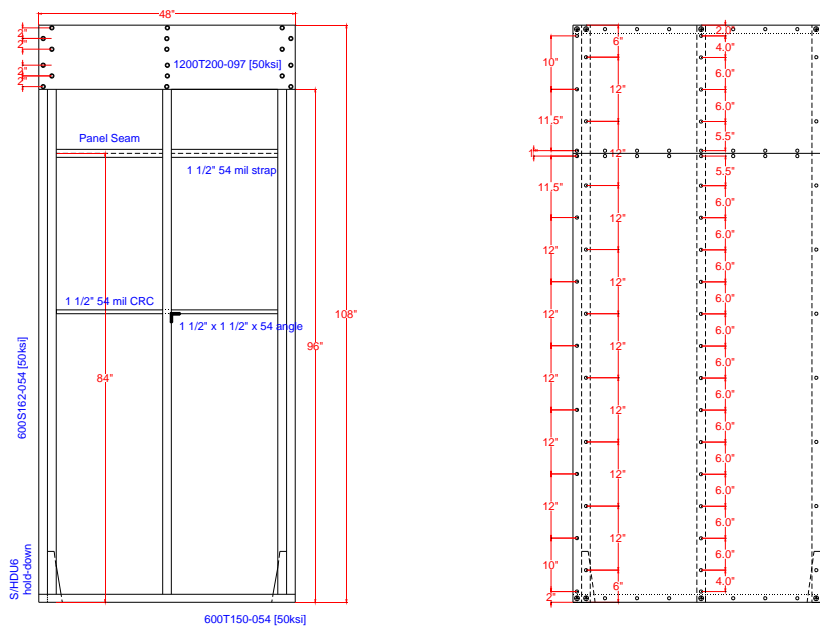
Shear wall specimen drawing (details are the same for 8 ft wide shear walls) (a) back (interior) view, (b) front (exterior) view.
